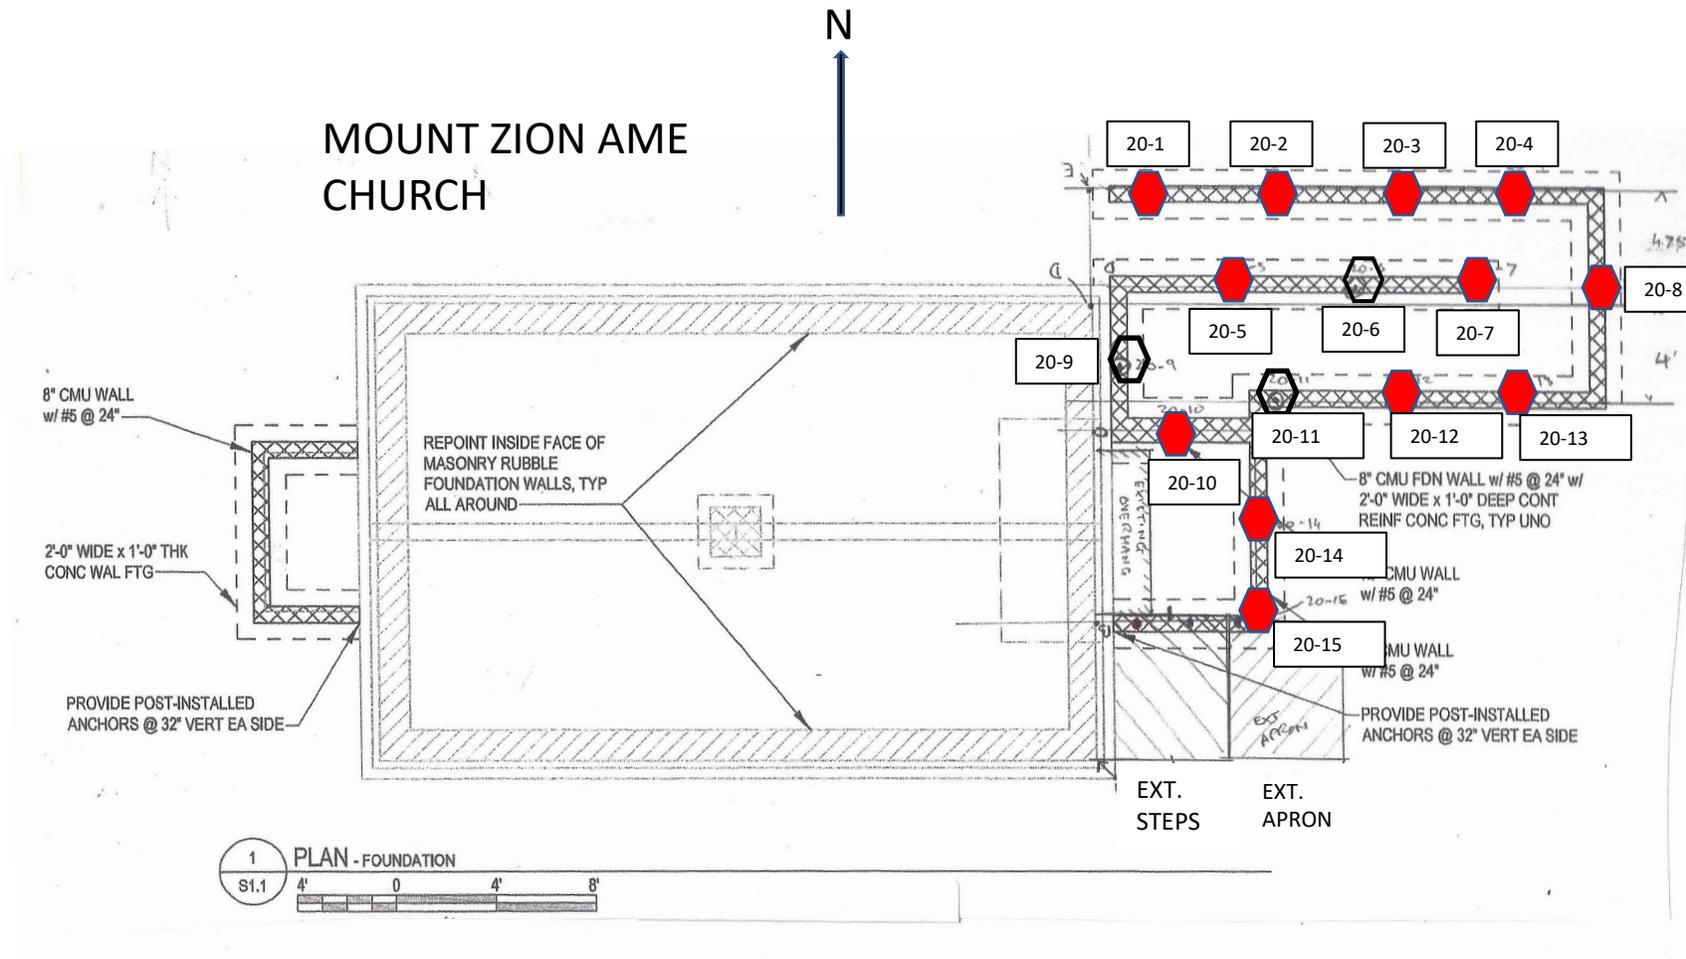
Completed (red) and planned (black outline) Shovel Tests 12/12/20 in relation to planned footings for ramp and east extension of building. Scale in feet. Base Map courtesy of Mills & Schnoering Architects.
